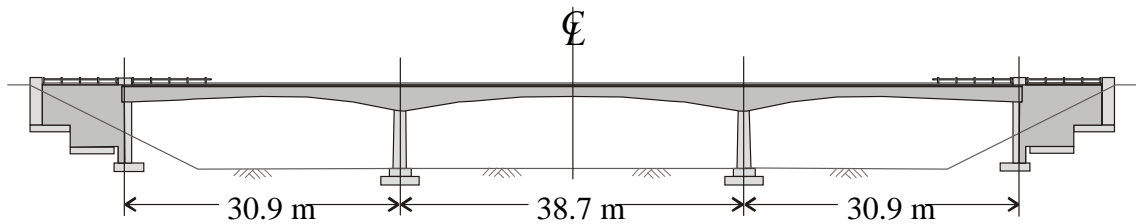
Bridge elevation (redrawn from Earth Tech 2001).
